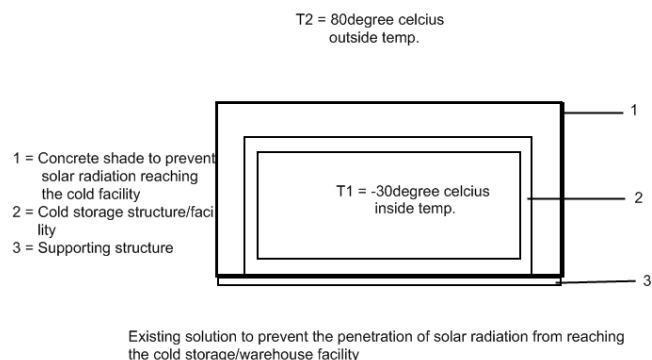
Existing structural arrangement to reduce solar rays on cold storage; cold storage facility built inside a concrete shade.
